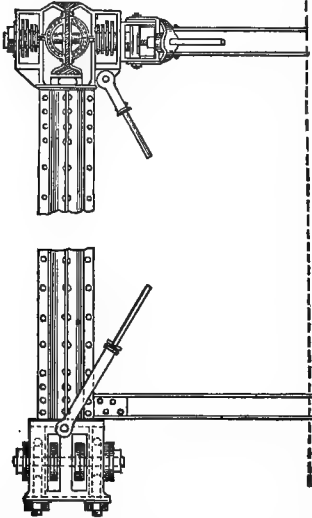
Section of Bridge as built by the Baltimore Bridge Co.
